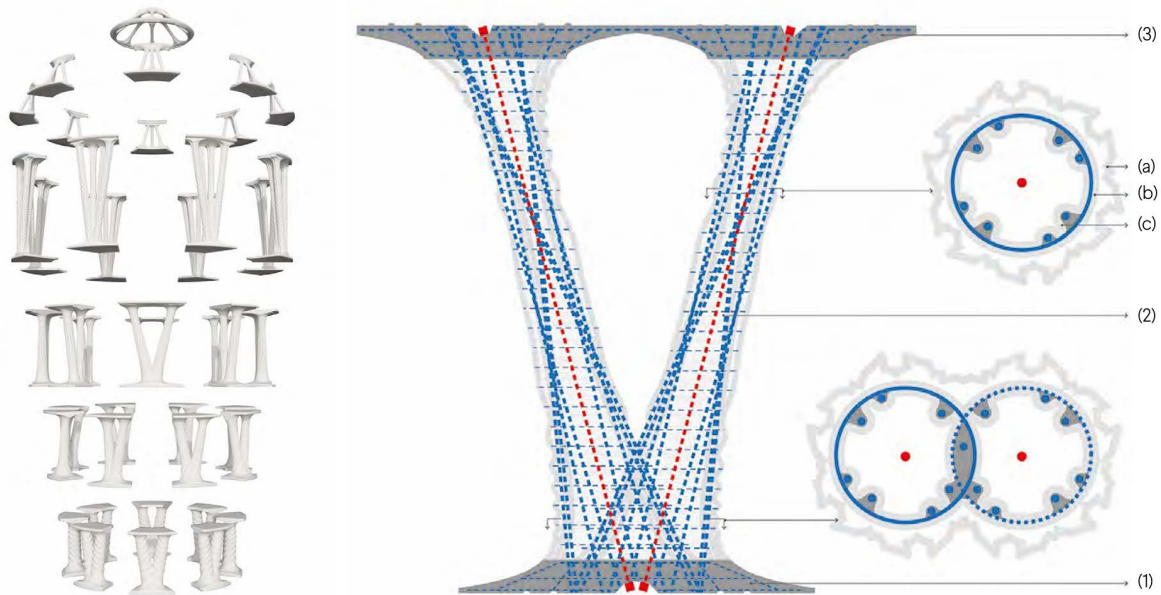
Left: Final design of Tor Alva composed of 41 bespoke components assembled using dry shear-keyed connections. Right: Diagram of a branching column component showing its three-part segmentation: (1) precast base segment; (2) load-bearing 3D-printed concrete column with (a) an outer layer providing ornamented texture, (b) a middle layer accommodating shear reinforcement, and (c) an inner layer forming hollow channels for longitudinal reinforcement; and (3) precast capital segment, taken from [59].
